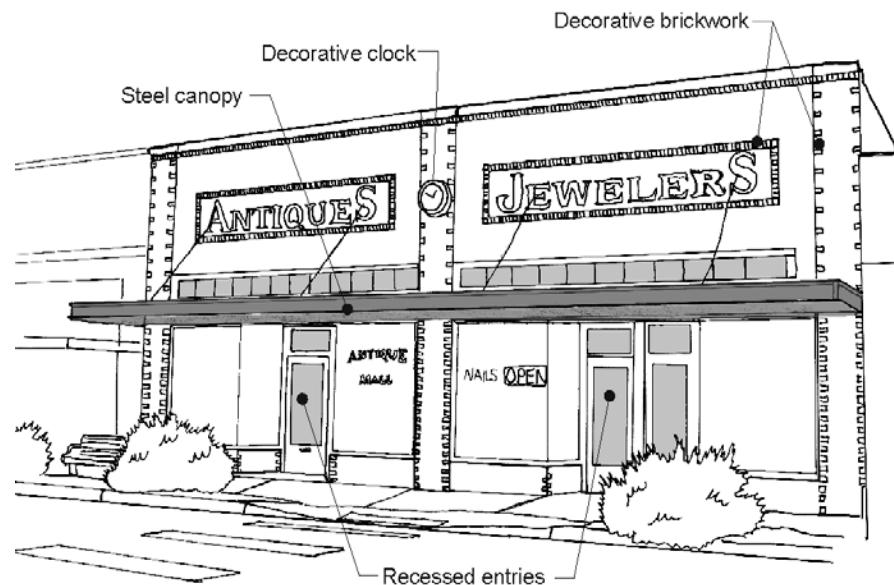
This older Downtown building would meet the current standards by including transom windows, a recessed entry, a steel canopy, a decorative clock, and decorative brickwork.
